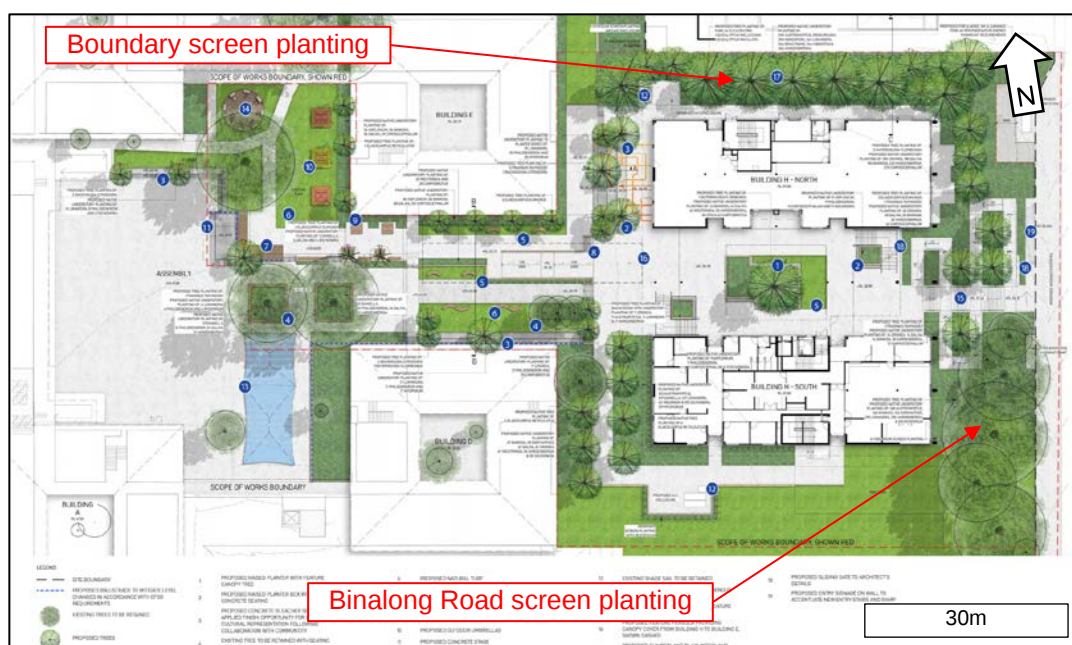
| Proposed landscape plan (Source: Applicant's Landscape plan 2021)
